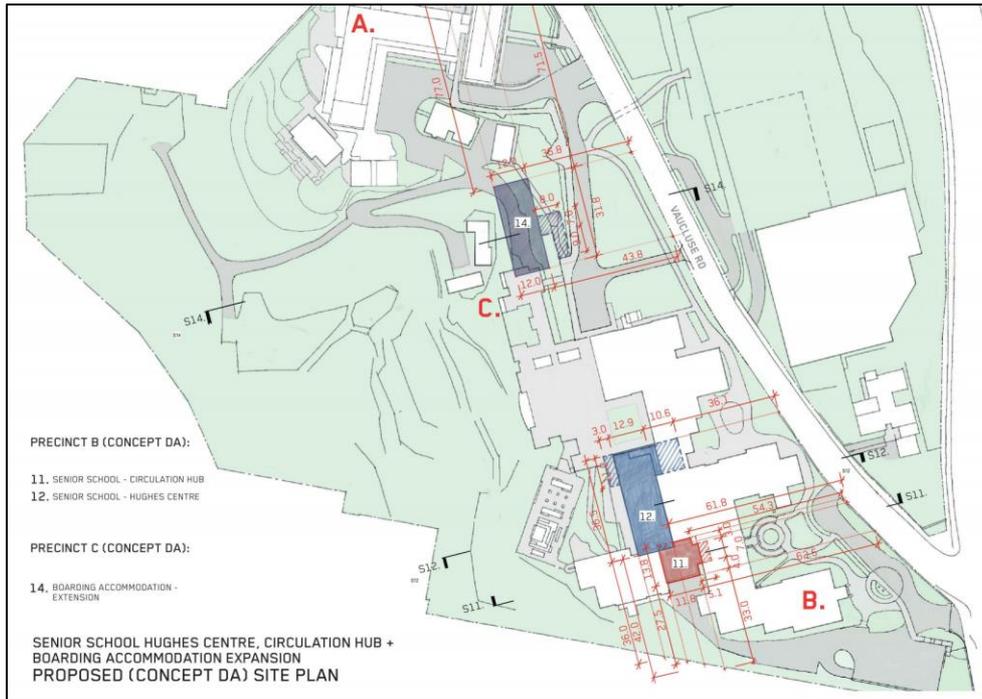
| Concept proposal site plan (Source: Applicant's RtS 2021)
